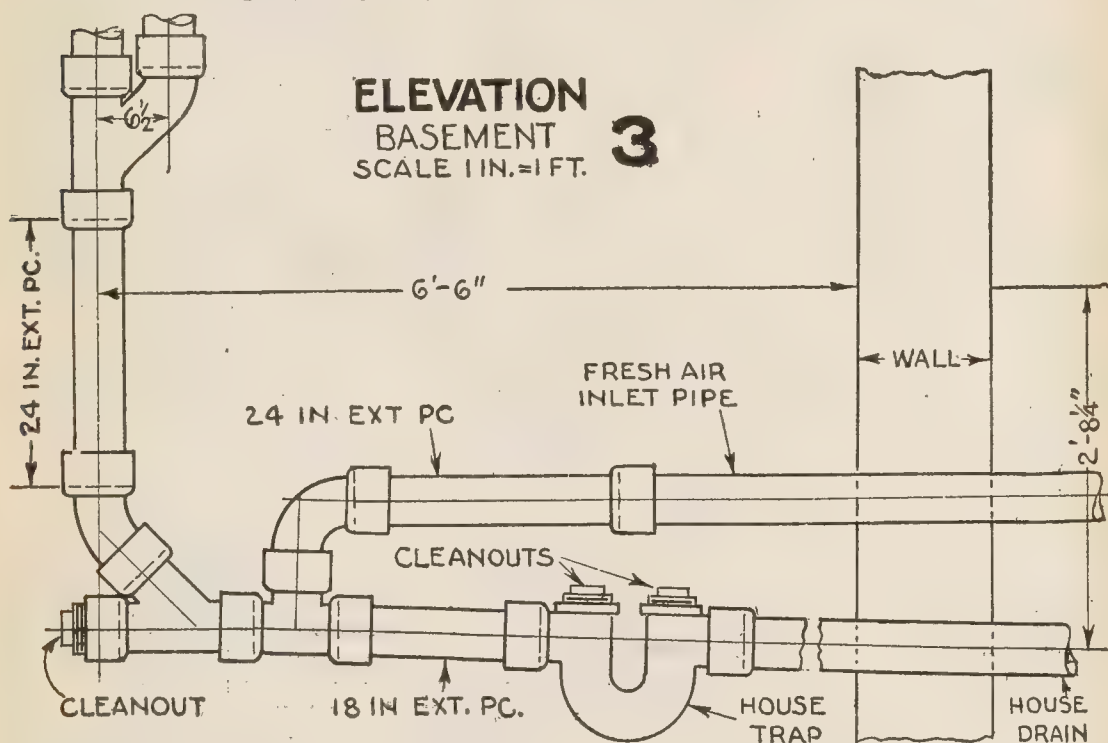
,996.—Elevation of roughing in for basement; installation having *soil and vent stacks or loop*.
